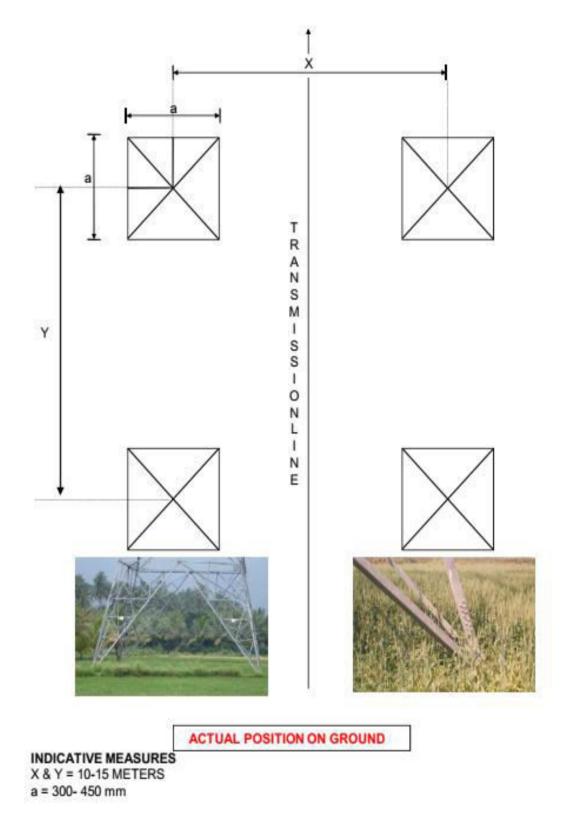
Typical Plan of Transmission Line Tower Footings Showing Actual Ground Position and Extent of Impact
